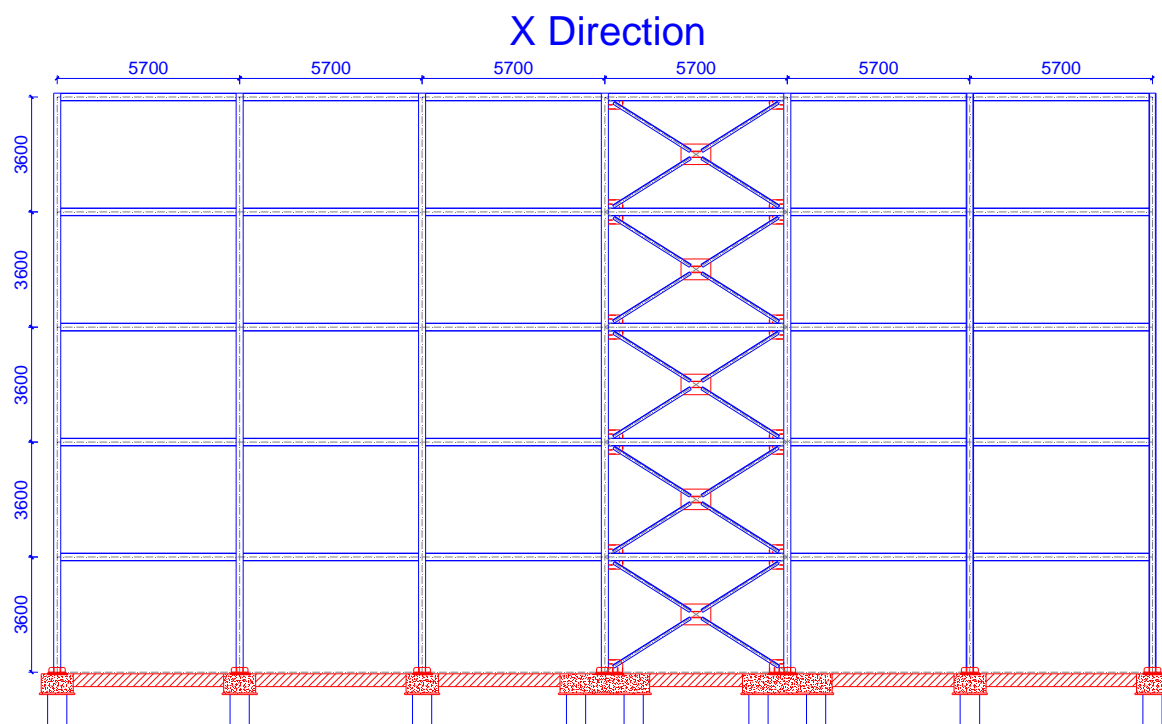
Frame Elevation – X direction – Asymmetric Configuration (length unit mm)
